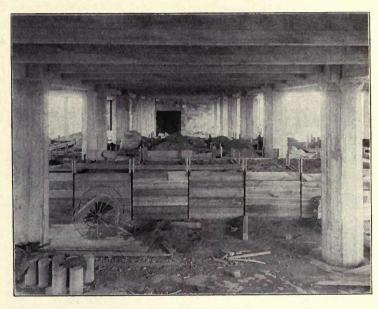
VIEW OF TEST LOAD IN TURNER-CARTER BUILDING.
